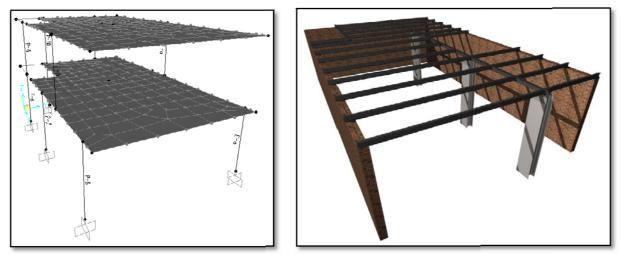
Left: Simplified 3D model of typical building, Right: Configuration of structural elements in partial steel masonry buildings
